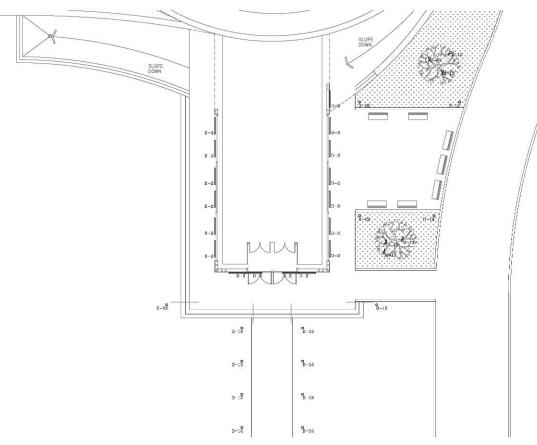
Reflected ceiling Plan (reference Appendix for luminaire types)
